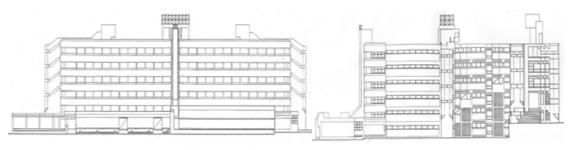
Left: North Elevation of Factory block. Right: West Elevation (Uytenbogaardt 1965-66).
